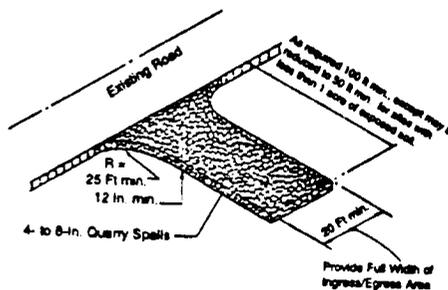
Stabilized construction entrance (from Washington Department of Ecology, 1992).
